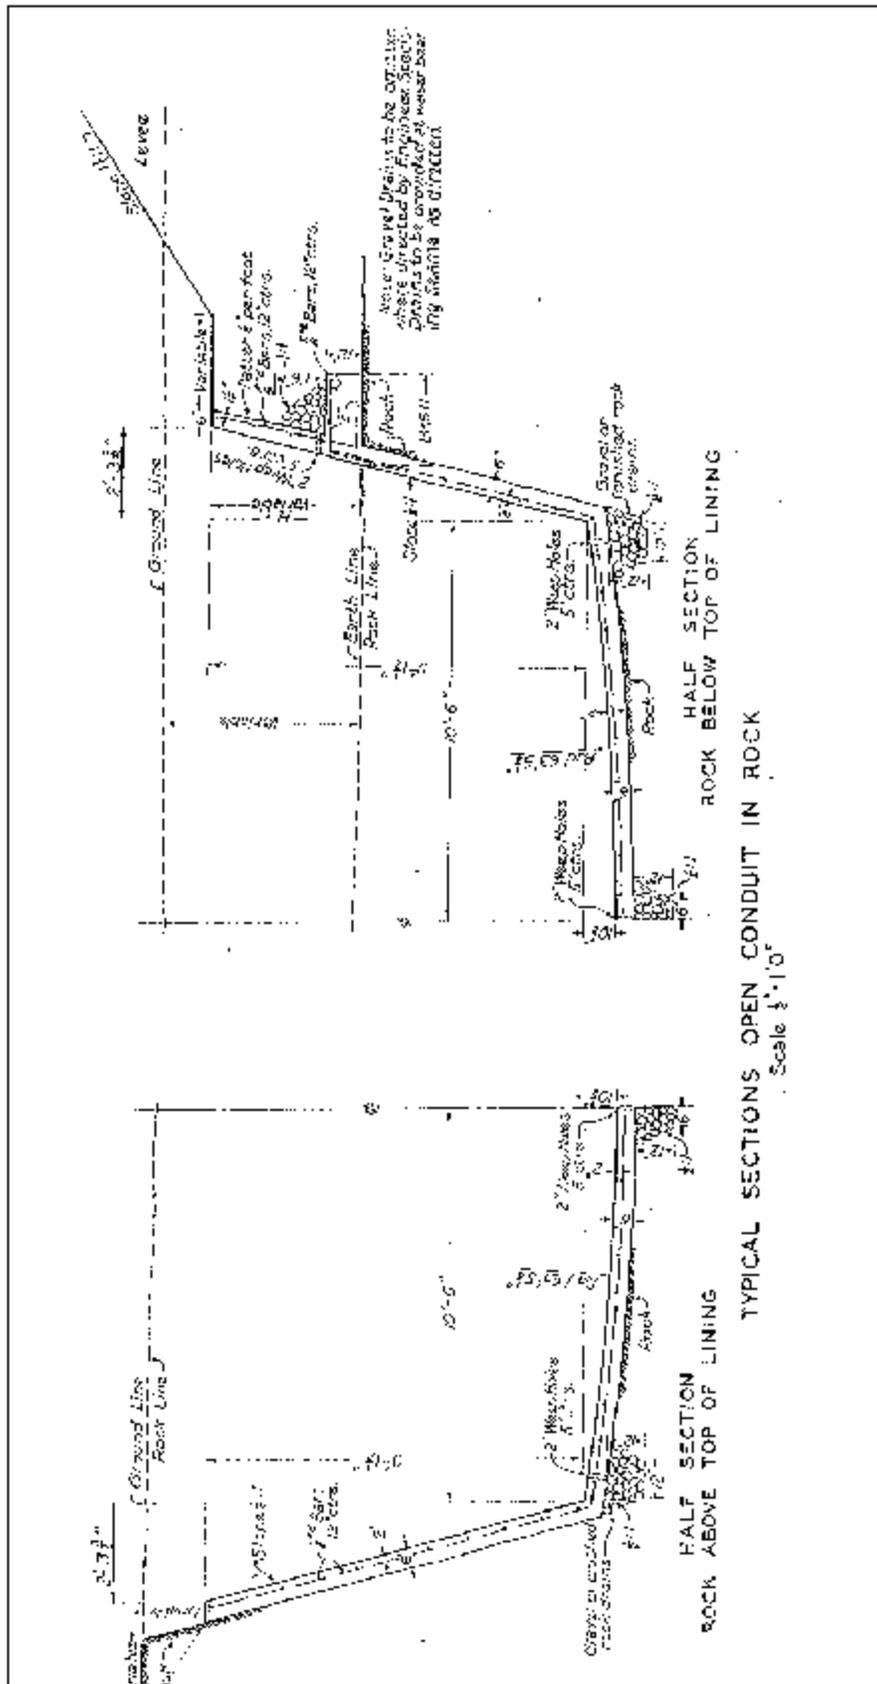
Typical Open-channel "B" Canal Cross-section.
